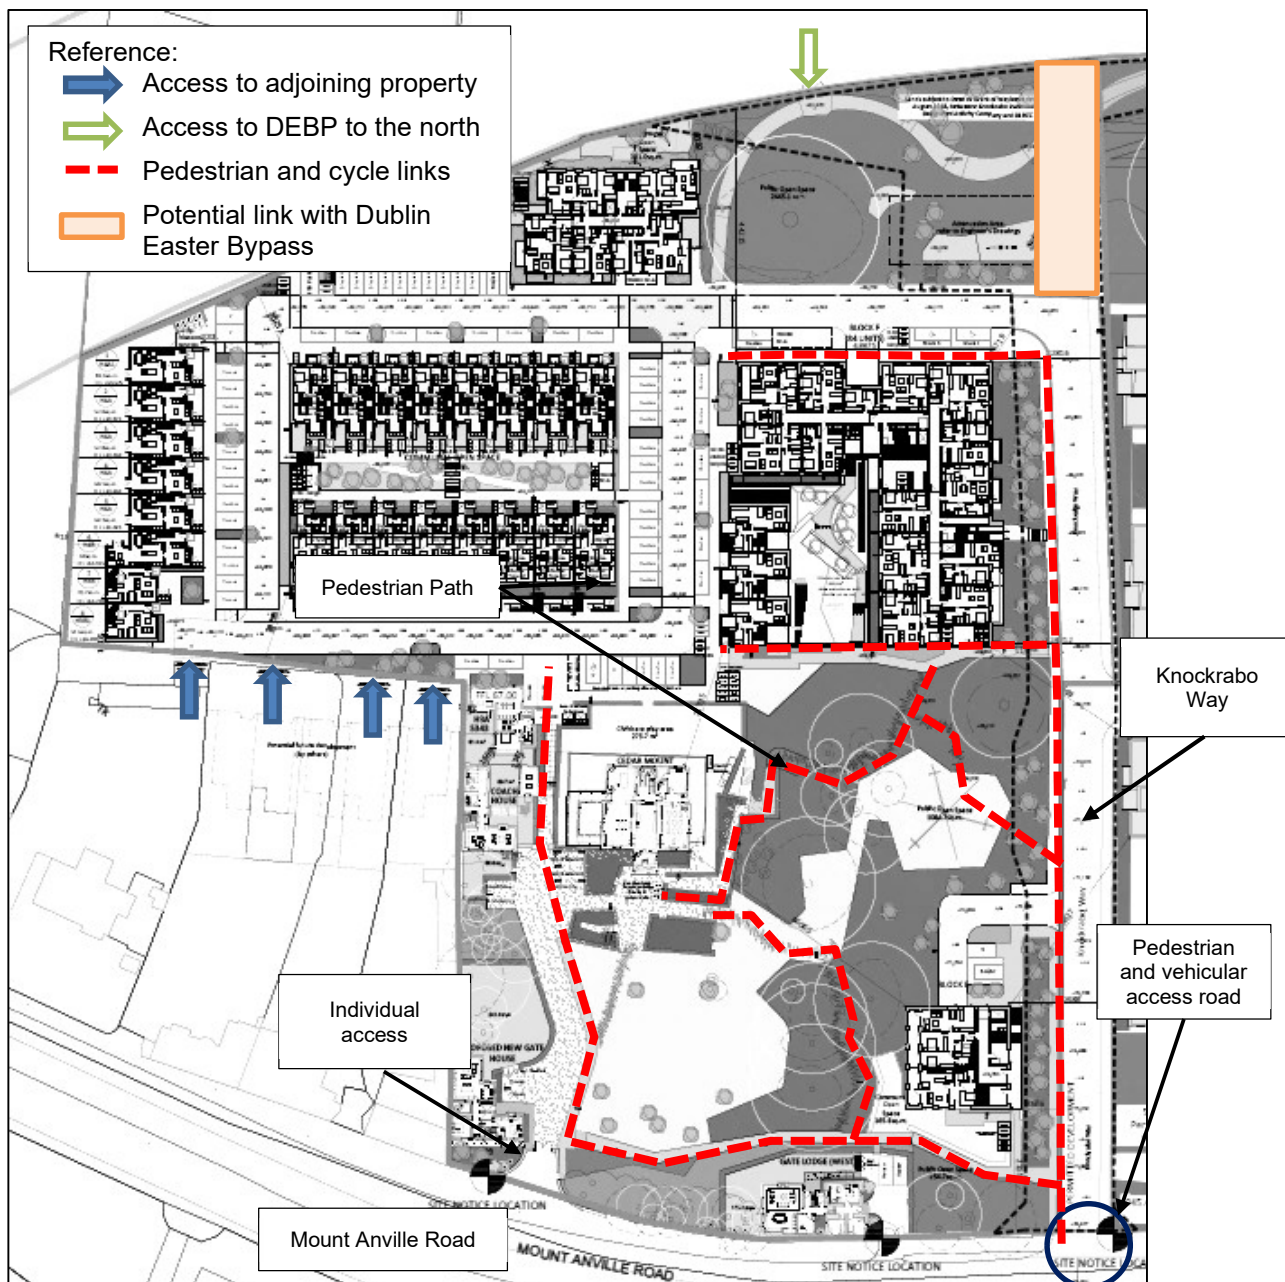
| Proposed Development – Internal Road Network and Site Access Point
